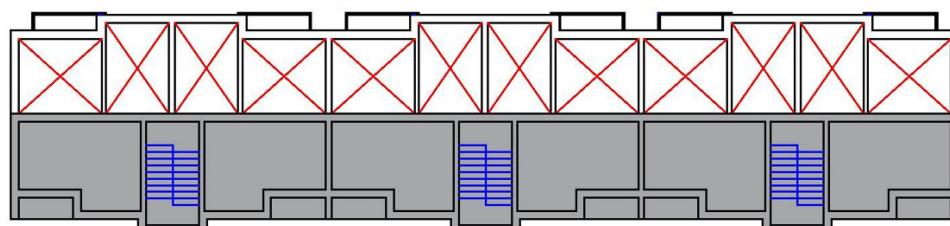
Retrofitting of an existing flexible floor structure by means of horizontal steel truss after the 2010 Kraljevo, Serbia earthquake.
